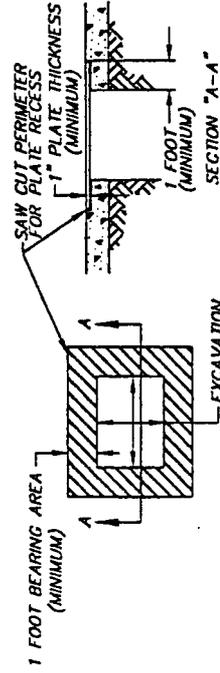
DETAIL FOR BITUMINOUS SURFACE PAVEMENT RESTORATION
